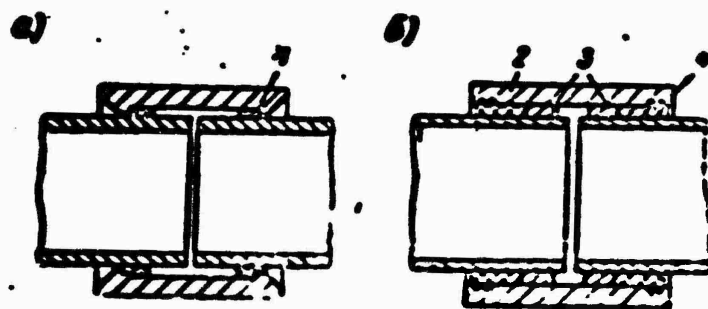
Unions for asbestos cement pipes. a) Pressure pipe joints; b) ordinary pipe joint. 1) Rubber ring; 2) union; 3) packing; 4) cement seal.
